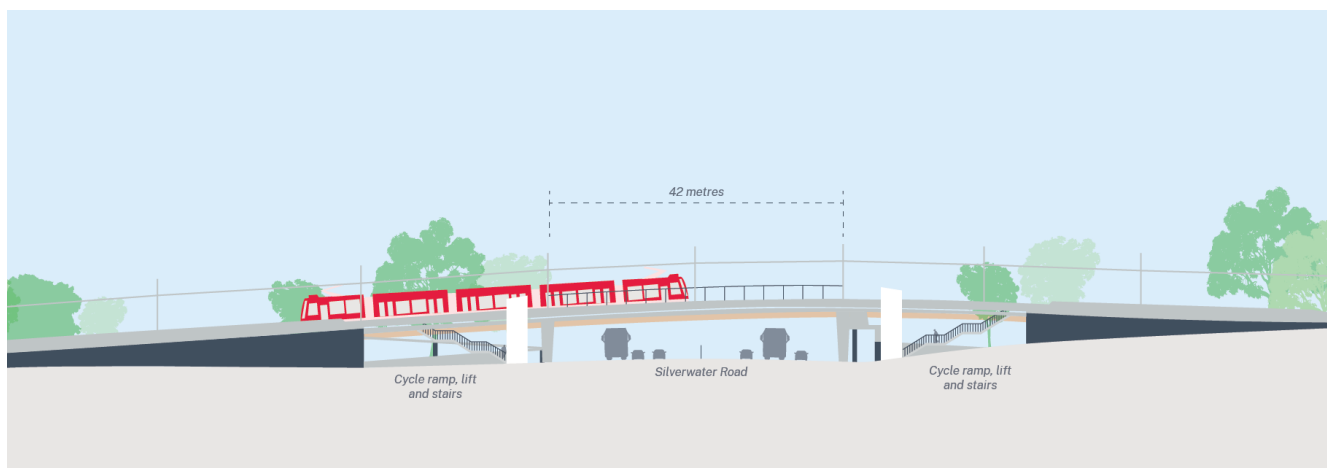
Indicative elevation of Silverwater Road bridge (viewed from the south)
